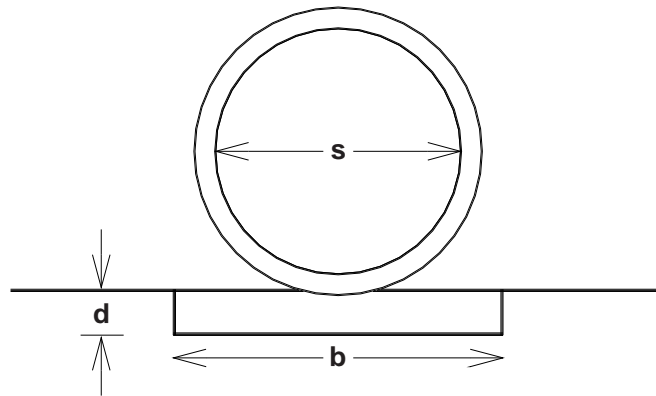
Foundation Treatment with Placed Bedding
